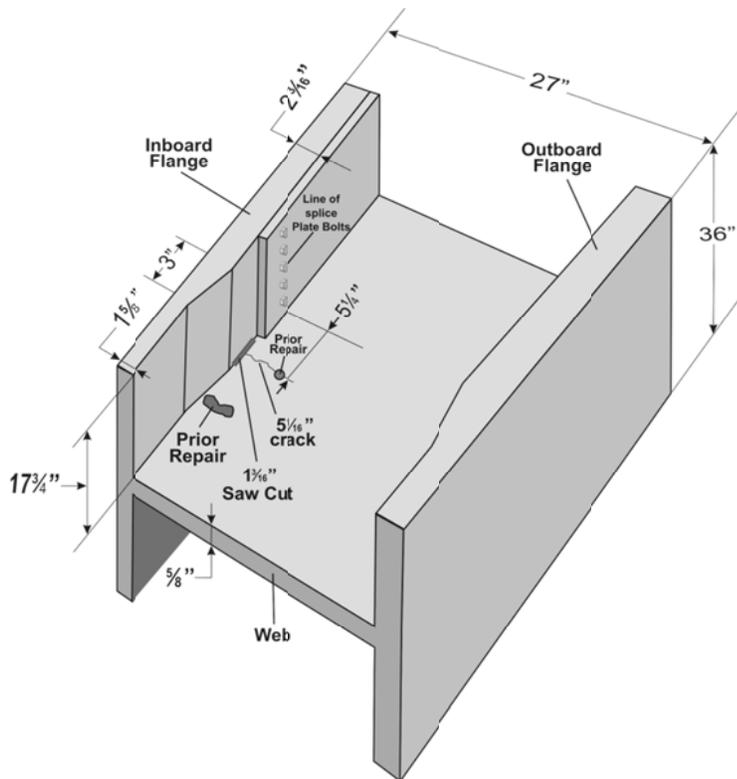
Schematic of H beam in Test Area Showing Locations of Crack, Repairs and Beam/Crack Relevant Dimensions.
